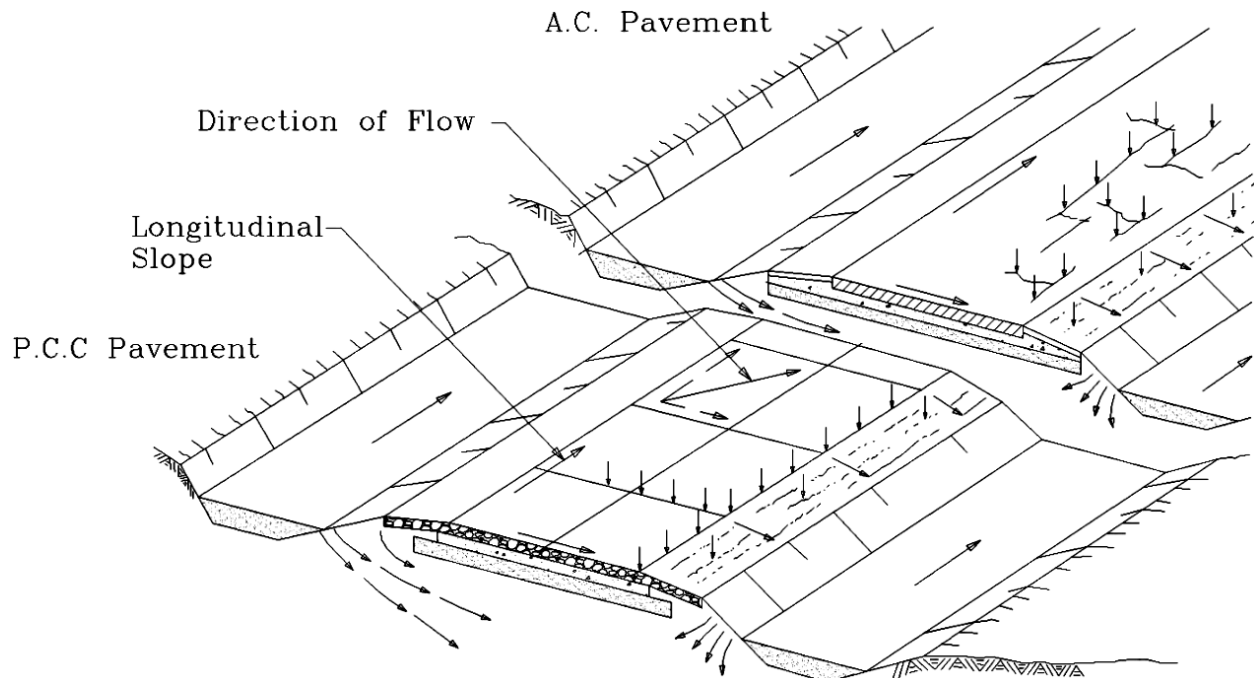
Points of entrance of water into the highway pavement structural sections (redrawn from Cedergren, 1973a).
